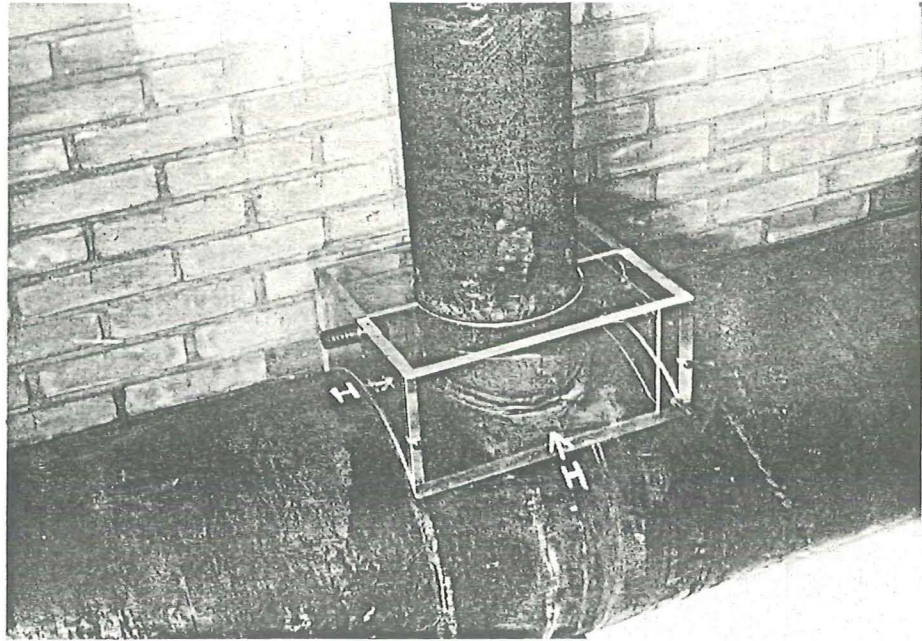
· Test set up for the corrosion fatigue test on tubular T-joints
